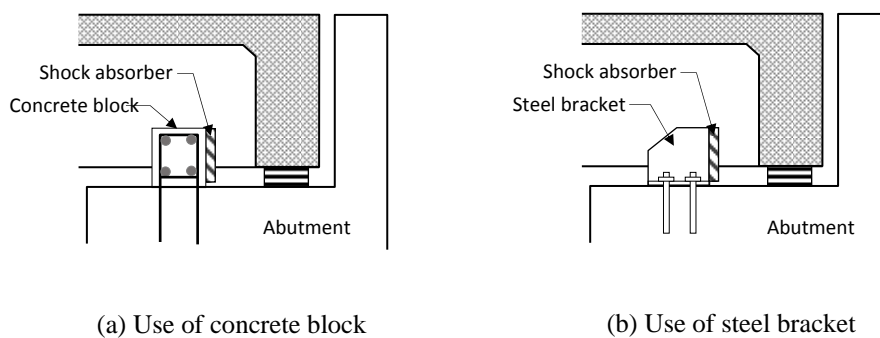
Examples of Unseating Prevention Structures Providing Protuberances on the Superstructure with the Substructure
